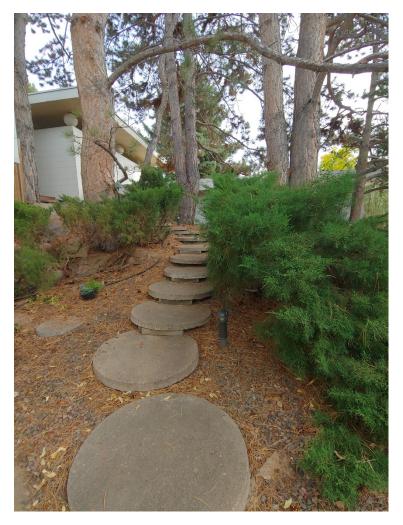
Backyard concrete steps to breezeway deck (original, according to owner)
